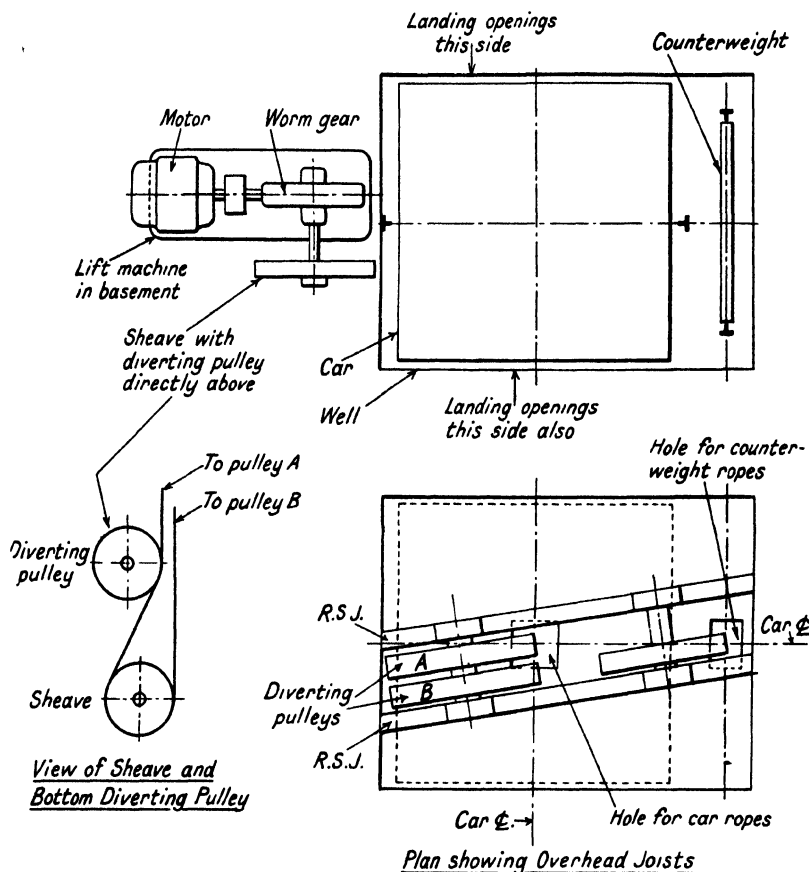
DETAILS OF TRACTION DRIVE WITH MACHINE BELOW
